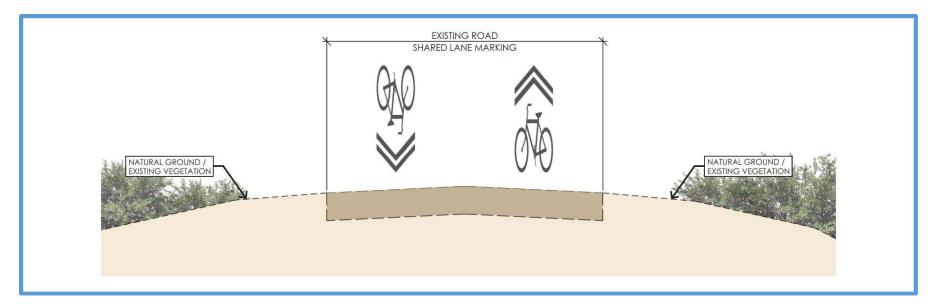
Typical Section, E-W CANA Alternatives 1A and 2A
